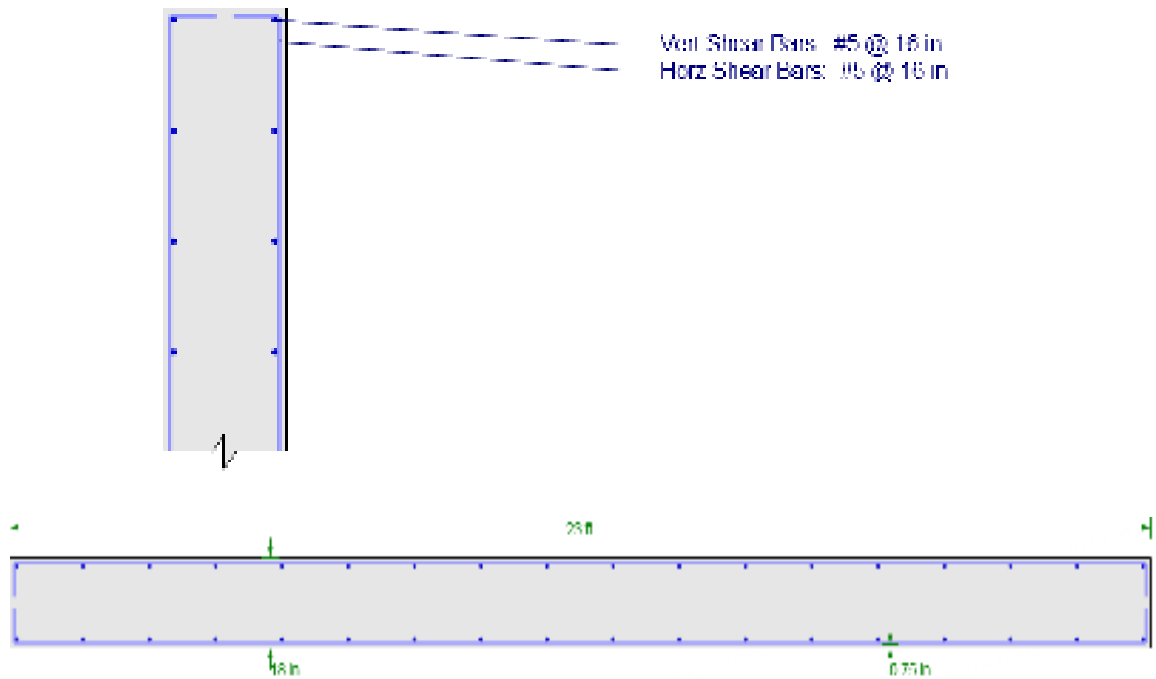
Building (B9-12S-H-S) Special RC Shear Reinforcement Details; Wall Section for Floors 10-12
